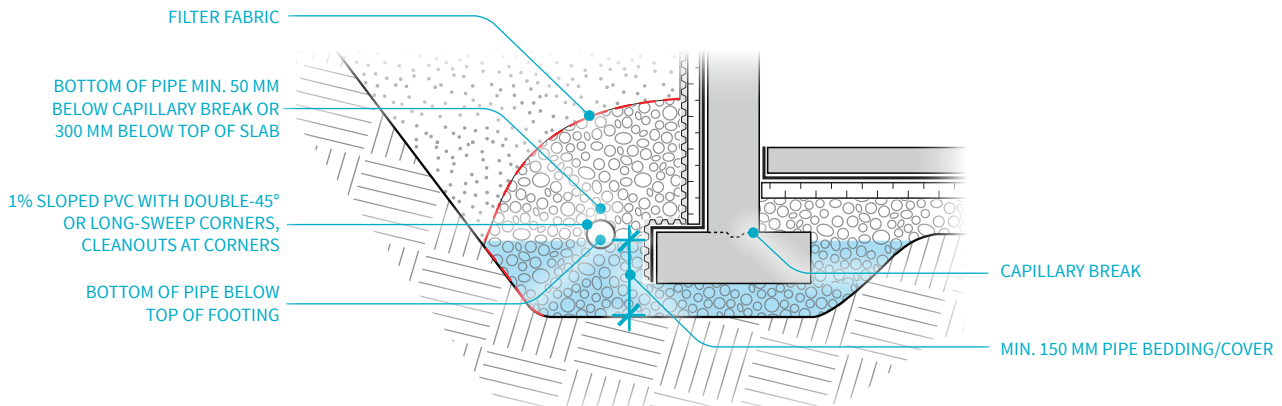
"Best practice" foundation drainage system with drain pipe set below the top of the footing.
